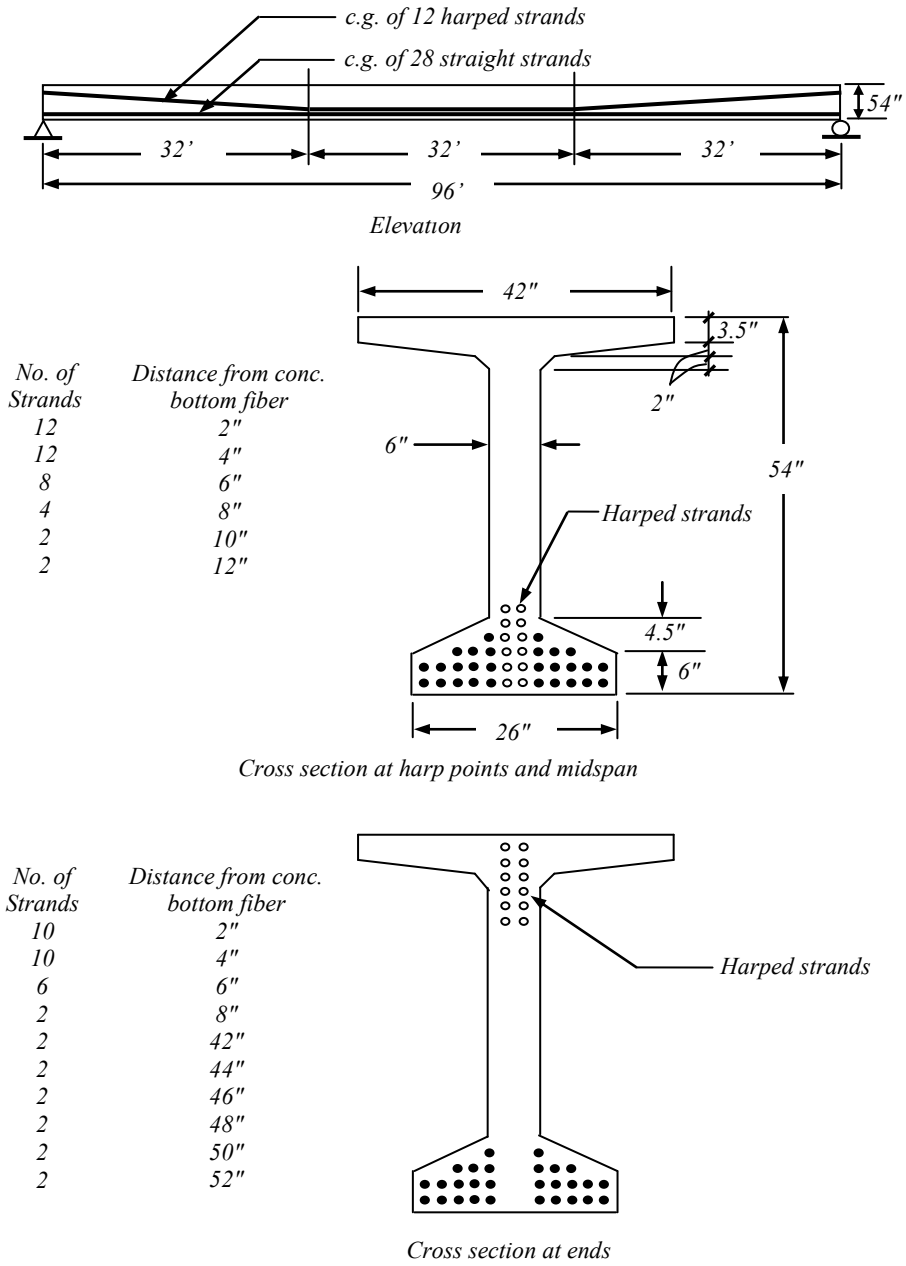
The elevation and cross sections of the Pretensioned concrete girder example
